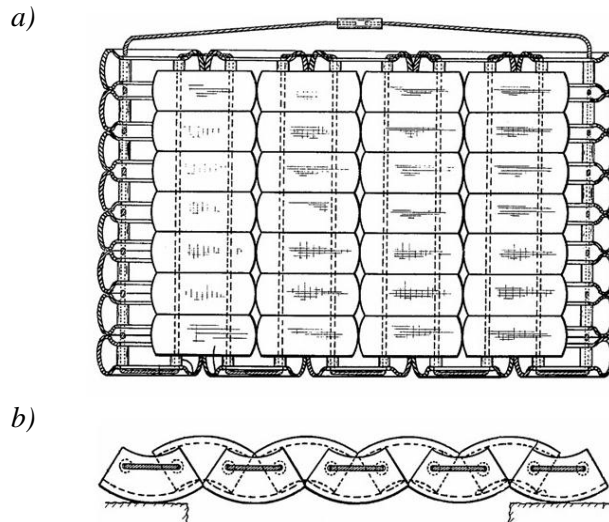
a) Plan and b) cross-section of blasting mat [10]
